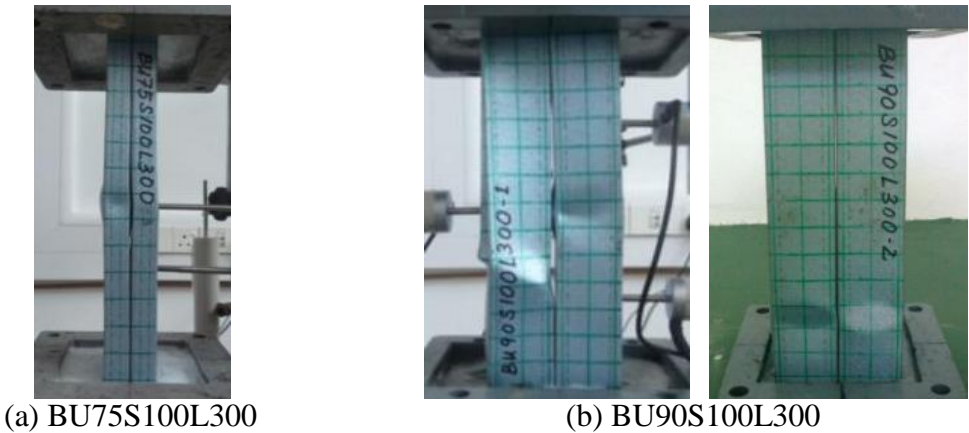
Failure Modes of Tested S100L300 Built-up Columns
